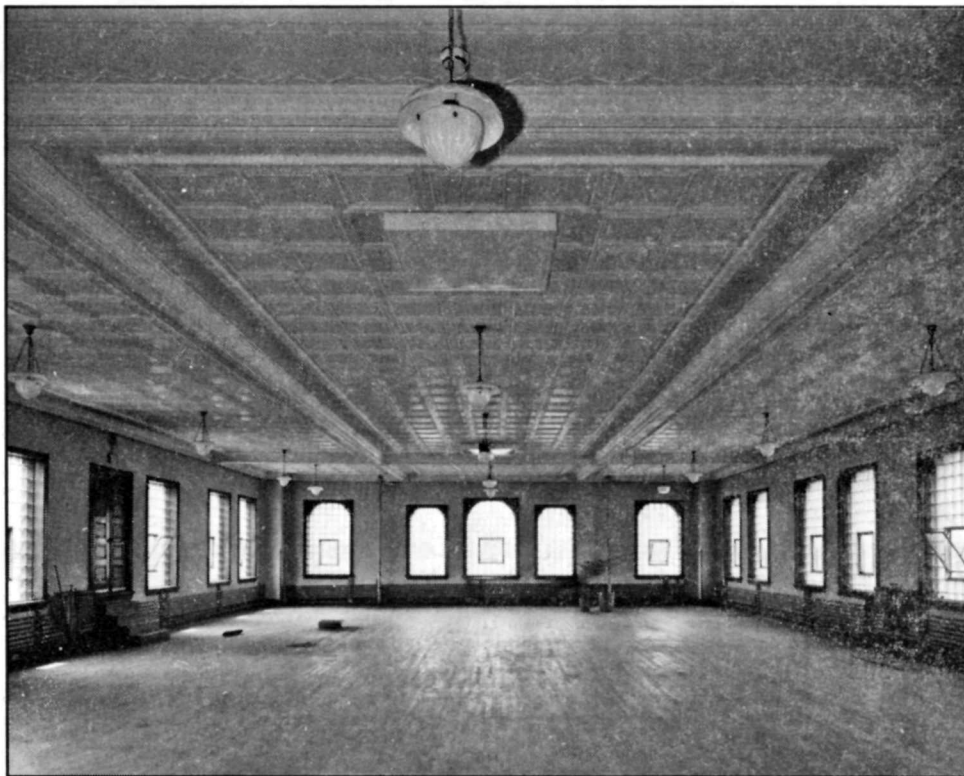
Masonic Temple, interior, fourth-floor banqueting hall and drill room.
